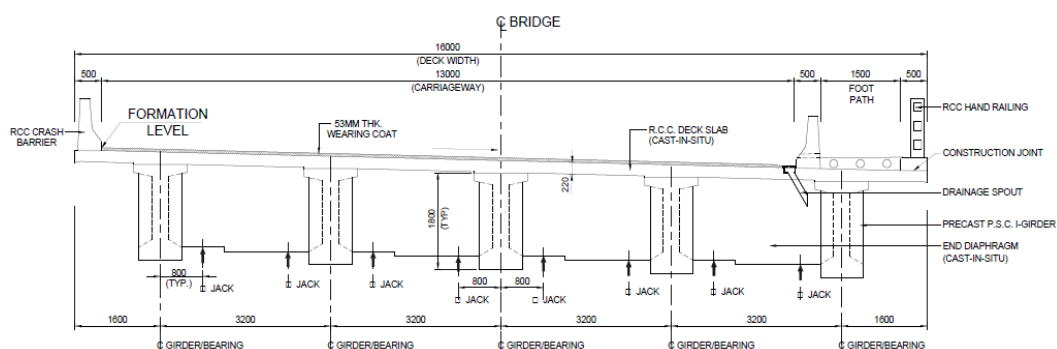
6 Cross section of 30m span OC post tensioned I girder at support
